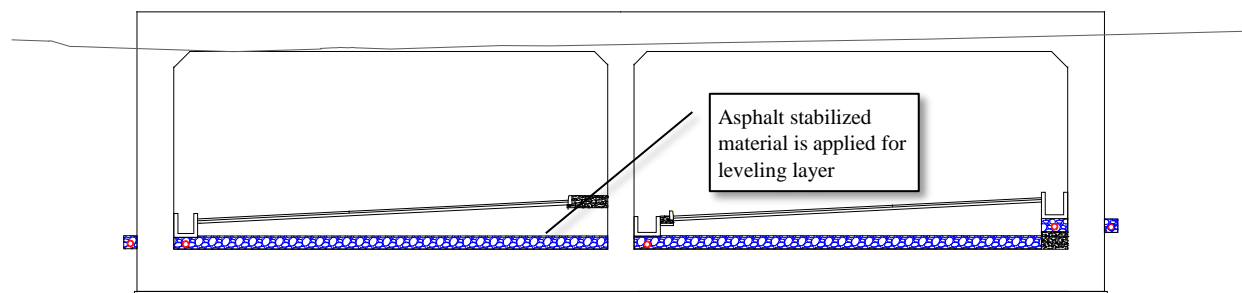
Typical Cross Section in Depressed Section
